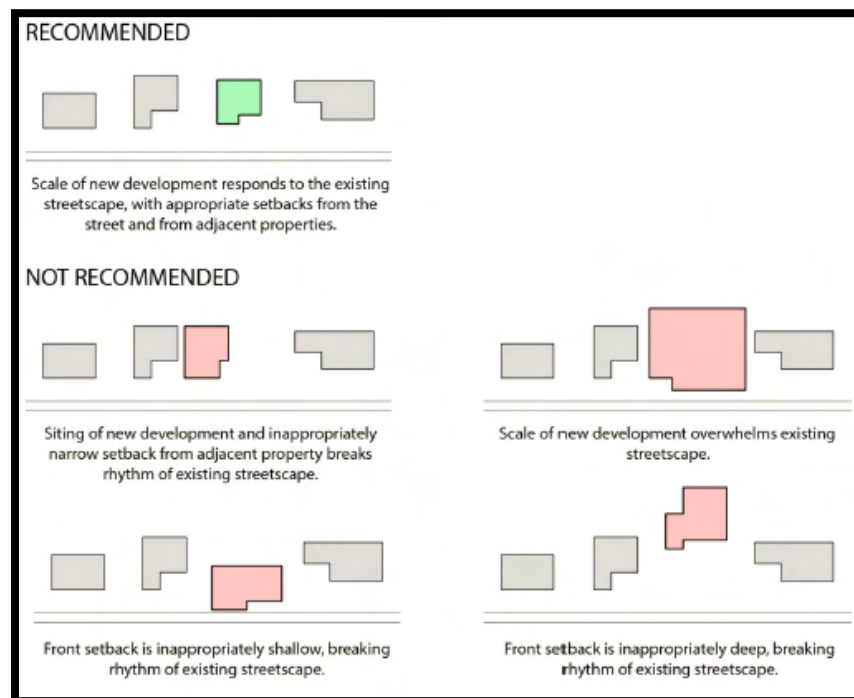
Guidelines for siting new development within the existing streetscape (Image courtesy of the City of Oakville First and Second Street Heritage Conservation District Plan)
